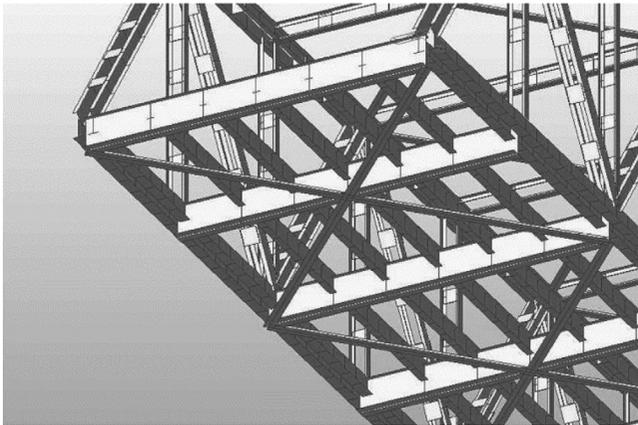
Detail of the deck (floor beams, stringers, and bracings).
